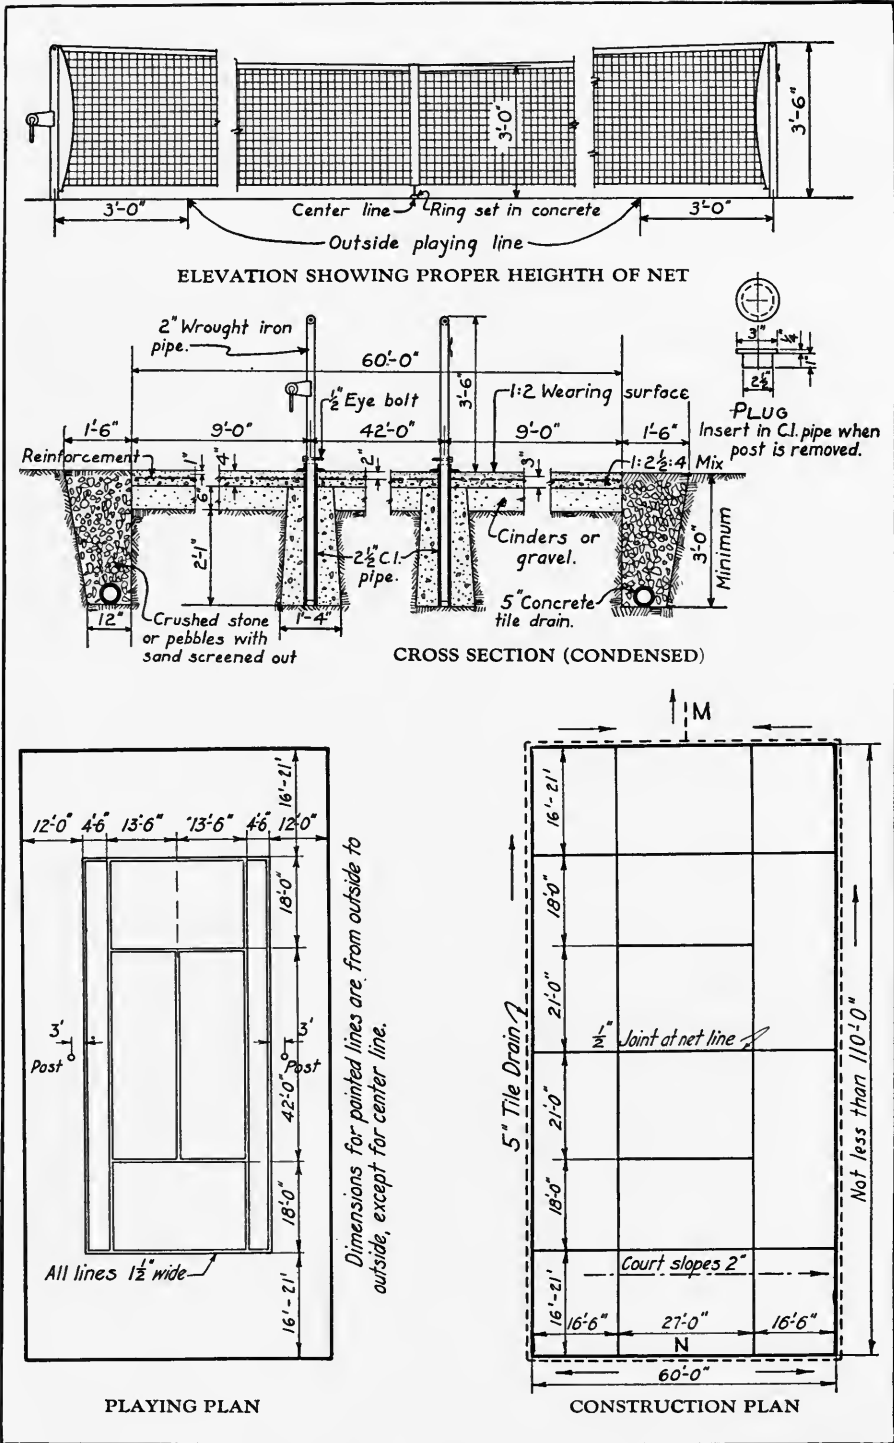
TENNIS COURT PLANS AND CONSTRUCTION DETAILS FOR CONCRETE COURT, PORTLAND CEMENT ASSOCIATION
